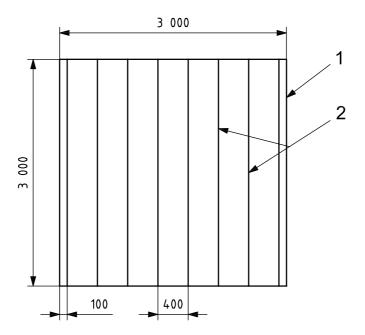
Details of horizontal supporting construction — Layout of inner layer of gypsum board and structural panels
